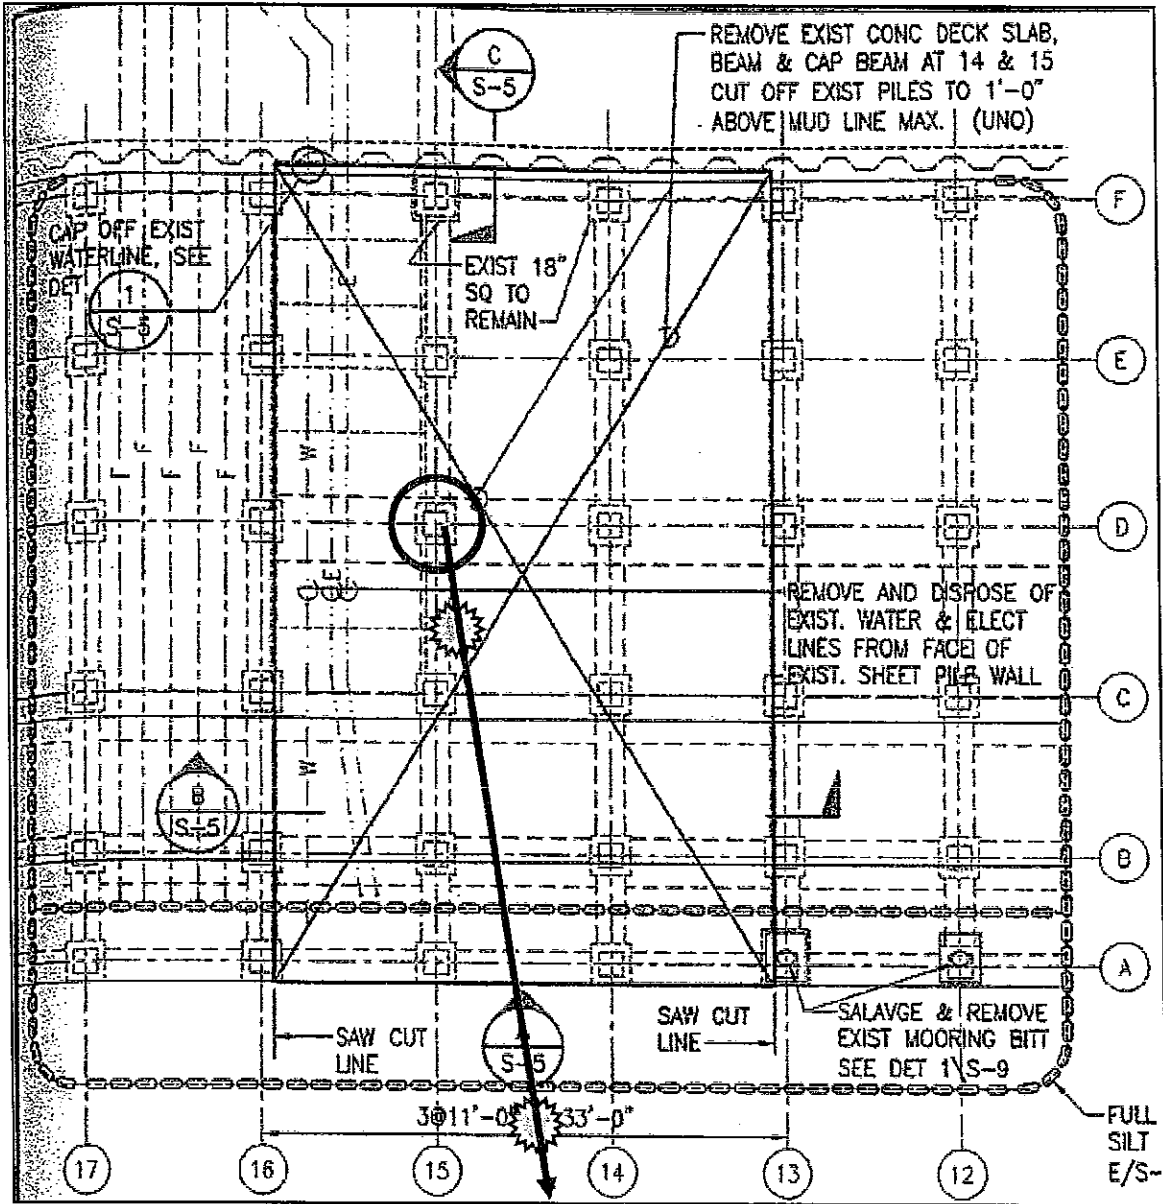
Location of the piles that will be monitored on Kaunakakai Pier. Hydrophones (red stars) will be placed 5 meters off the piling (red circle) and 2 meters after the silt curtain are shown on the plan. The third hydrophone, located at the 50 meters standoff distance, will be located on the radial alignment (red arrow).
